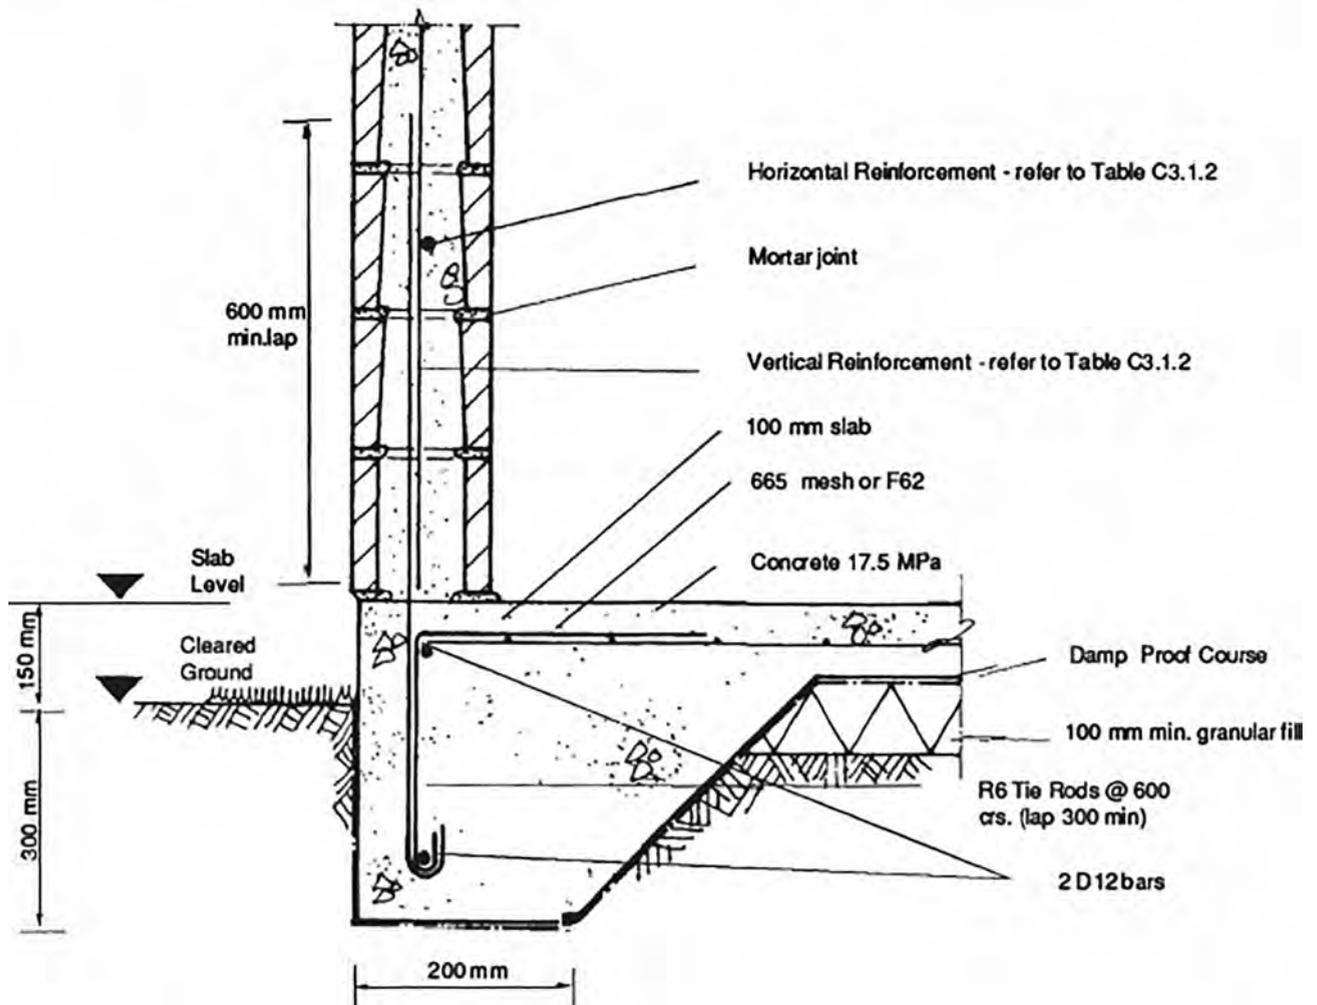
DETAIL OF FOOTING - IN LEVEL WITH SLAB
